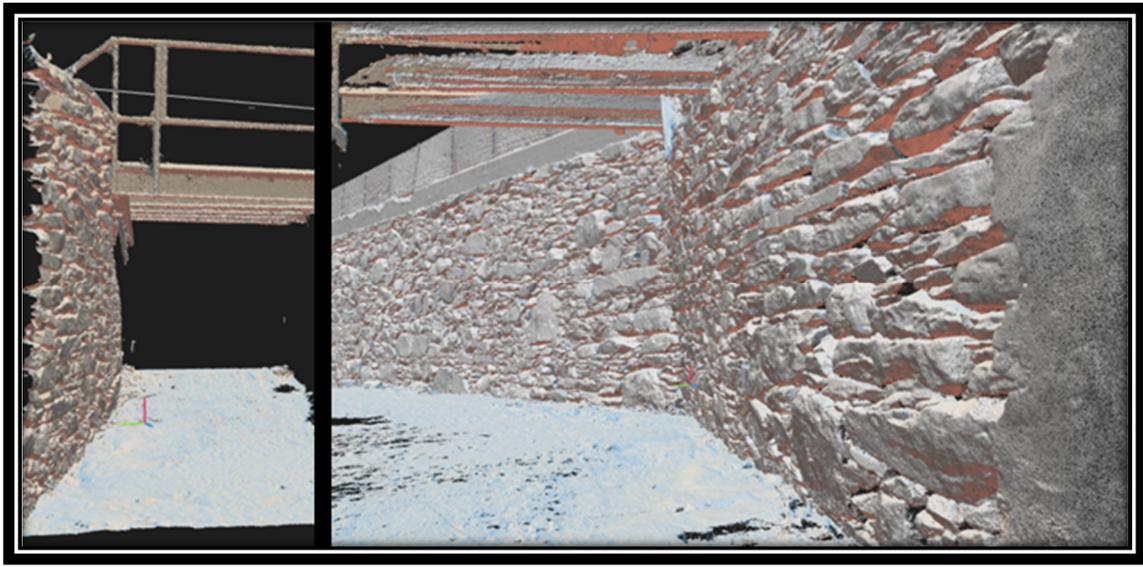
3D Point Cloud Scan at the Slanted Region of Wall
